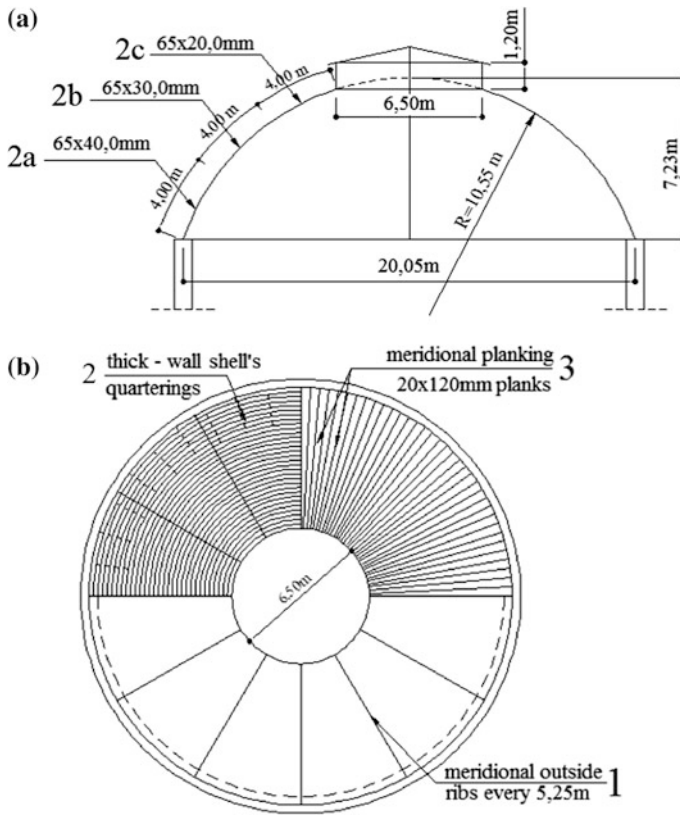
Schematic diagram of a thick-wall dome with outside ribs [15, 16], a cross-section of the dome, b lay-out of outside ribs, quarterings and meridional planks
